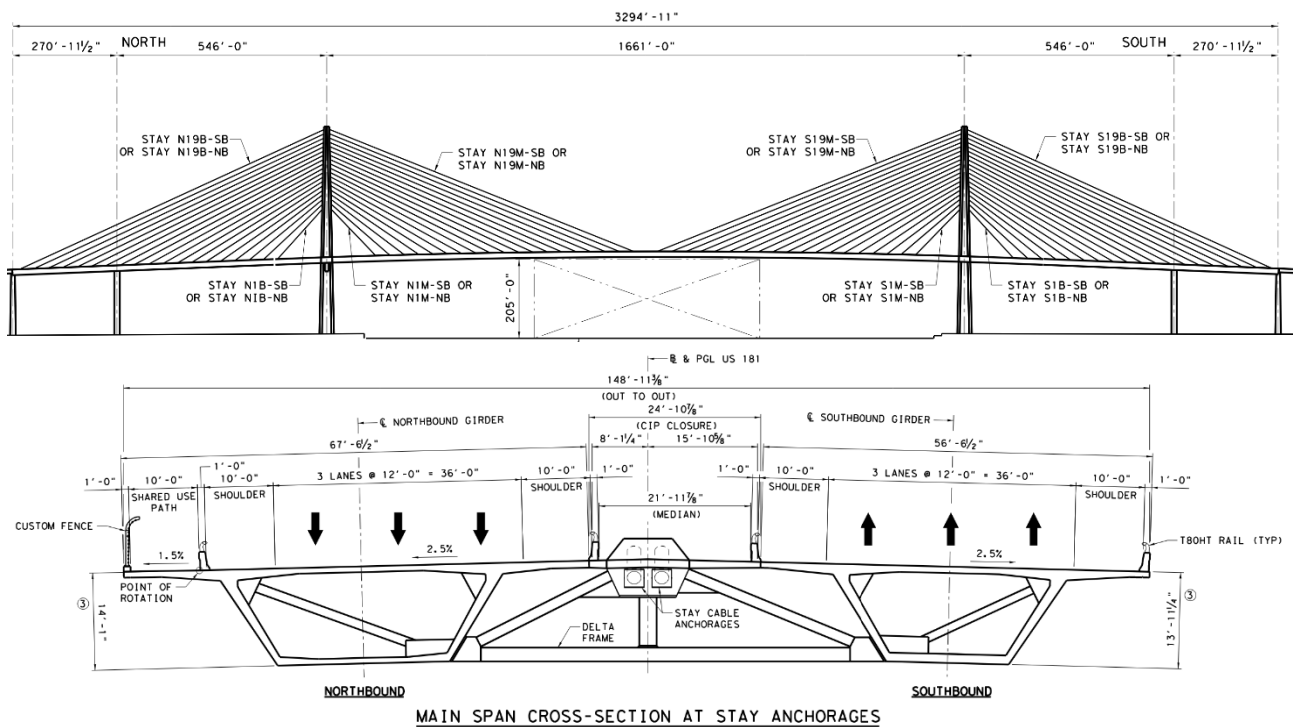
New Harbor Bridge. Main span elevation and cross section at stay anchors.
